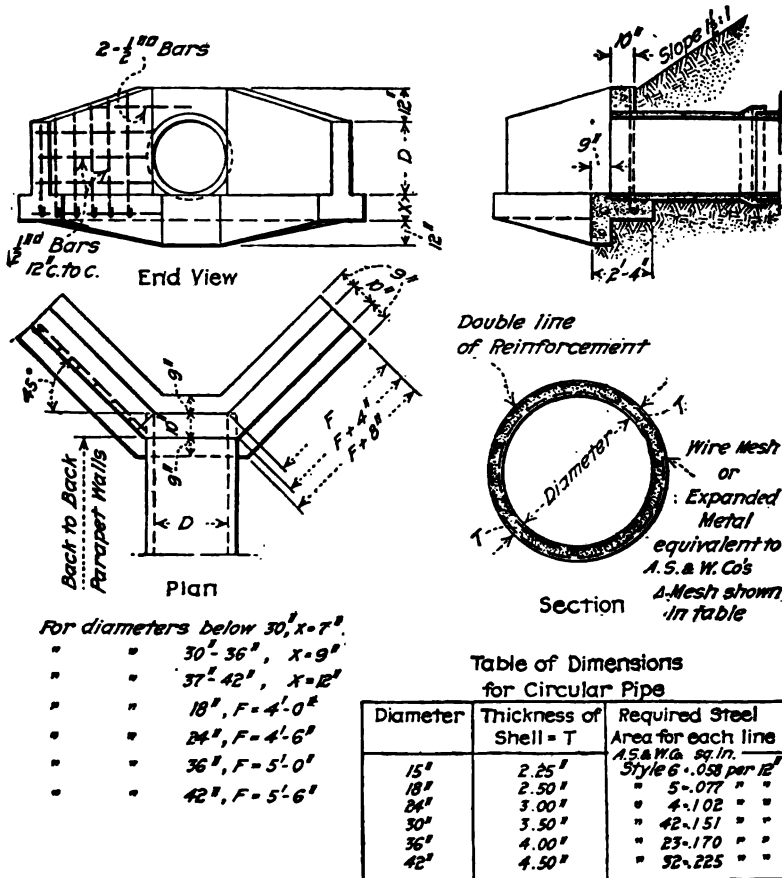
Standard dimensions for concrete pipe culverts with concrete head-walls, Iowa Highway Commission.
